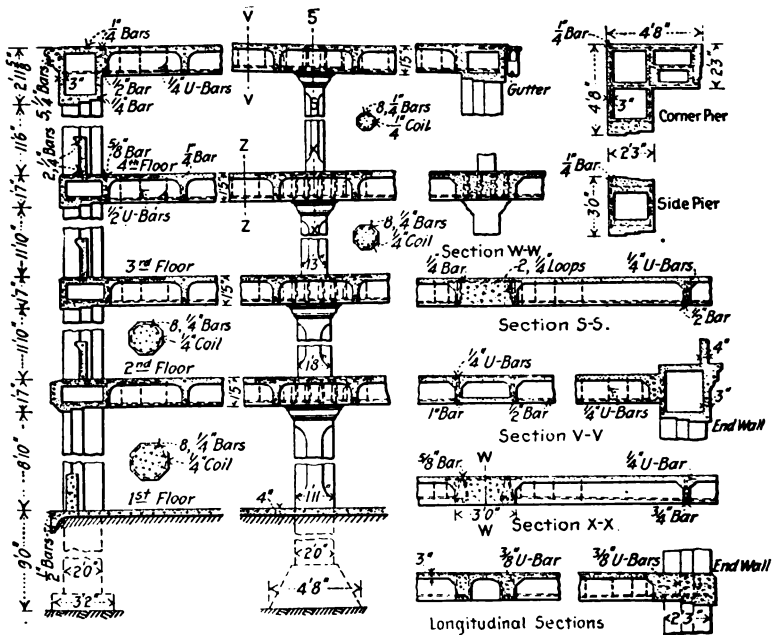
Floor and Wall Details, Kelly & Jones Factory.
